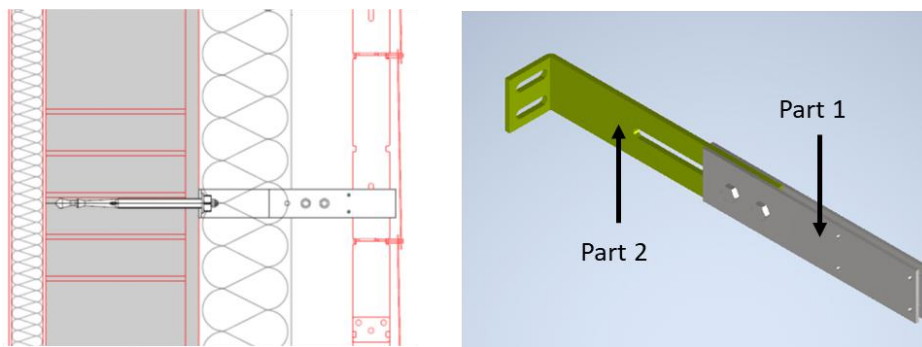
SCHEME AND POSITION WAY OF THE WIND ANCHOR ON THE WALL
